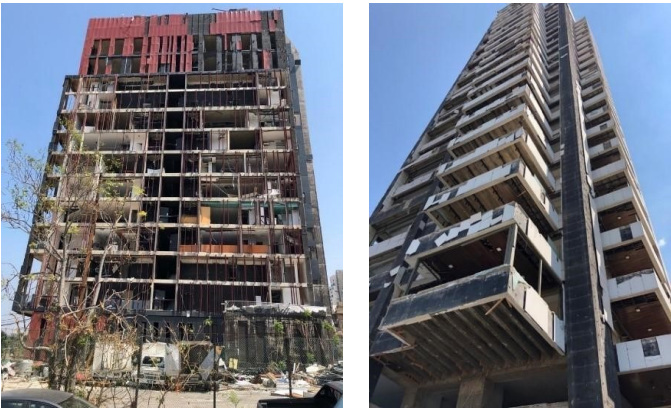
Post-2010 Reinforced Concrete Building Façade Damage
